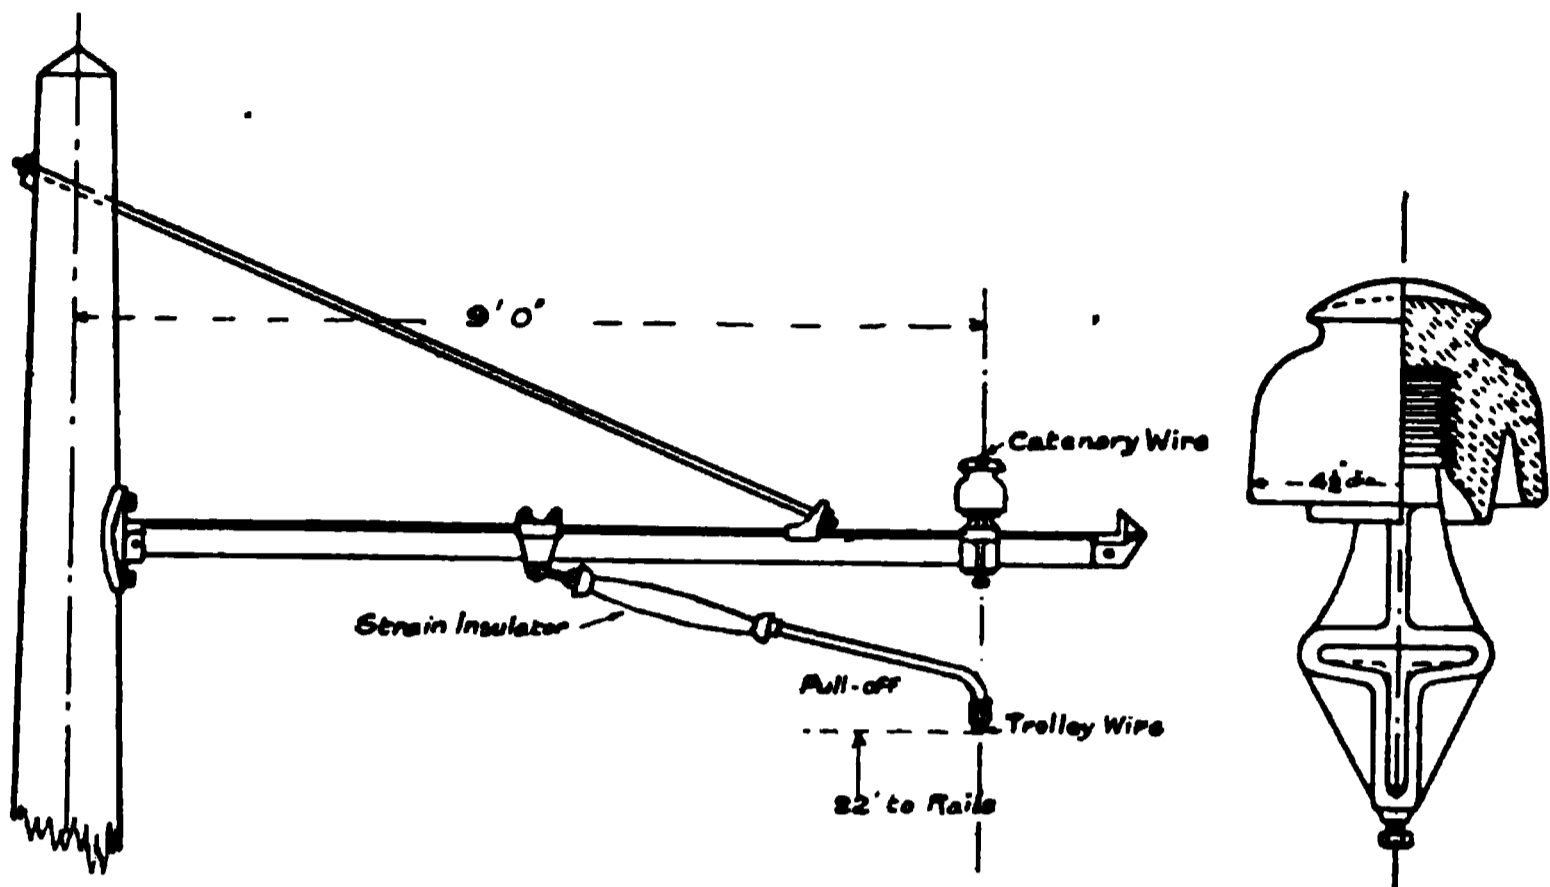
Bracket-arm Construction for 6600-volt Light Railways.
